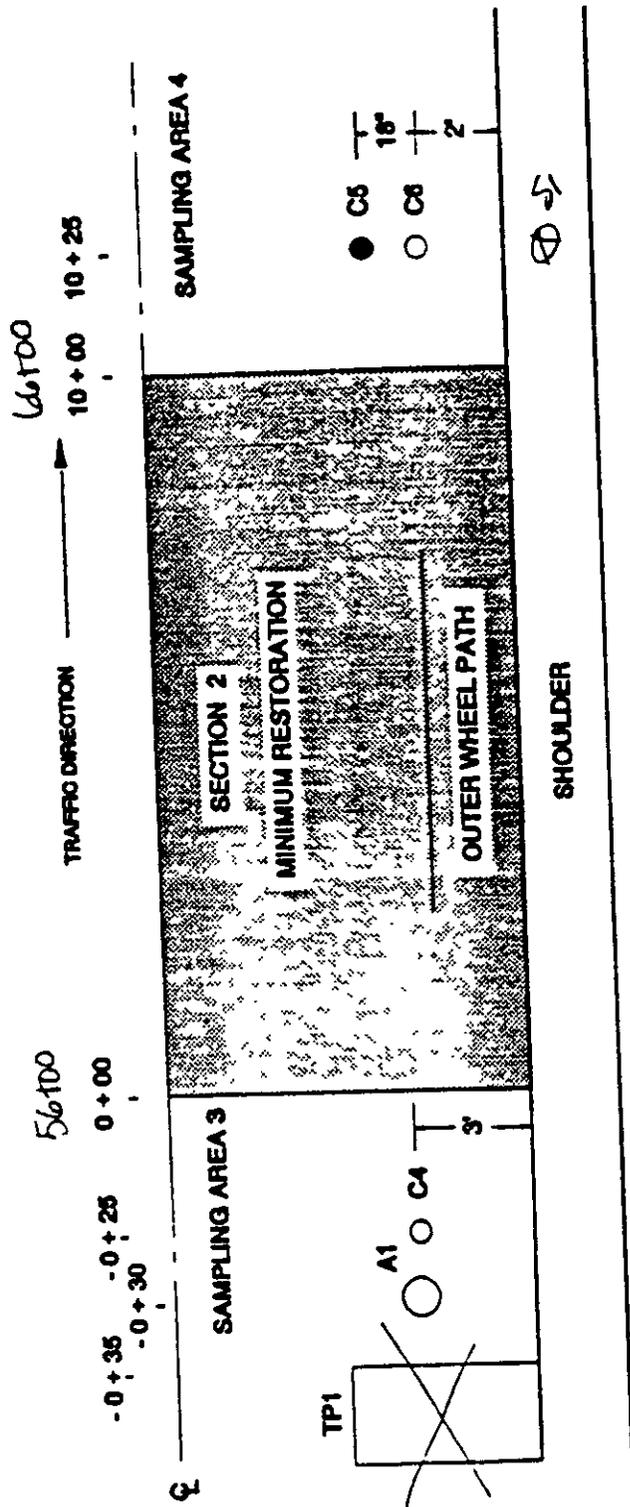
Example of "Pre-Construction" Sampling Plan for Test Section 1
